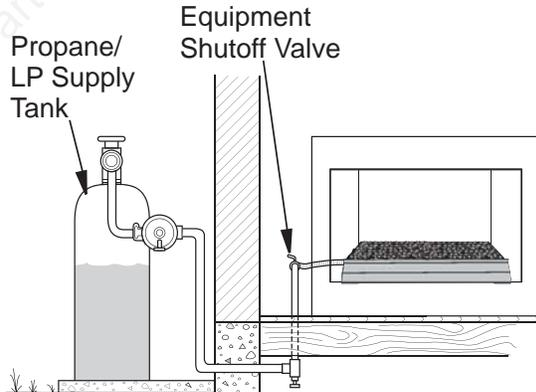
Checking Gas Joints for Propane/LP Gas Fireplace
